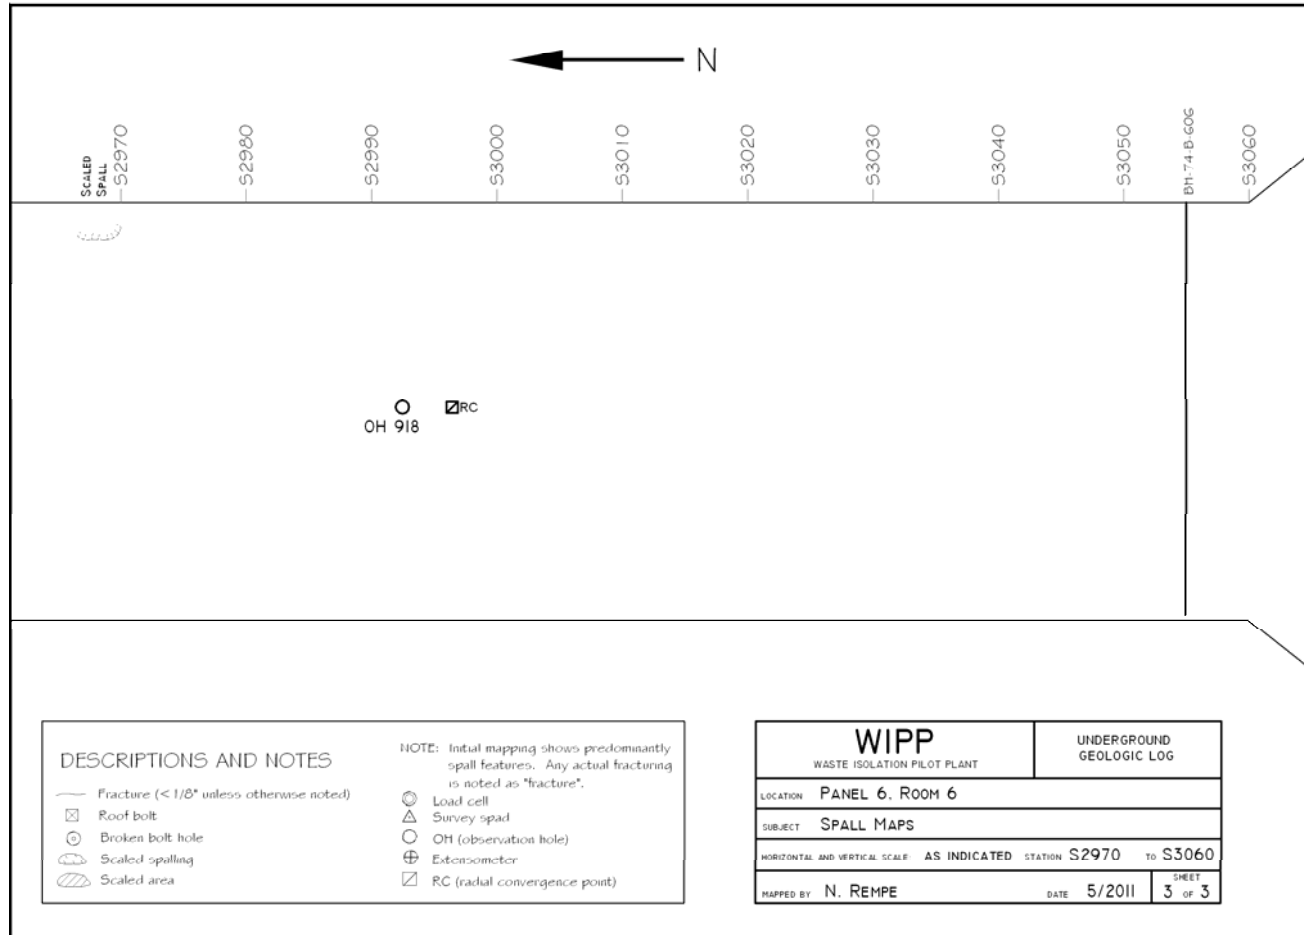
Panel 6 Room 6, S2770-S3060 Roof Fractures (Sheet 3 of 3)
